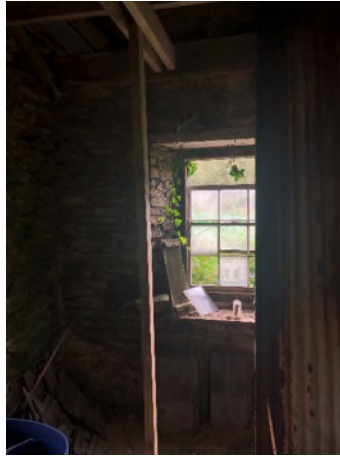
Internal image of window 09 in the south eastern facing wall.
